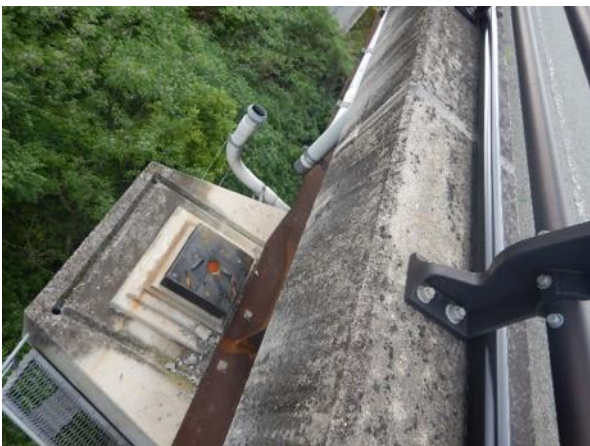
A curved steel arch bridge jumped laterally off bearings (N 32.8426; E 130.9272).
